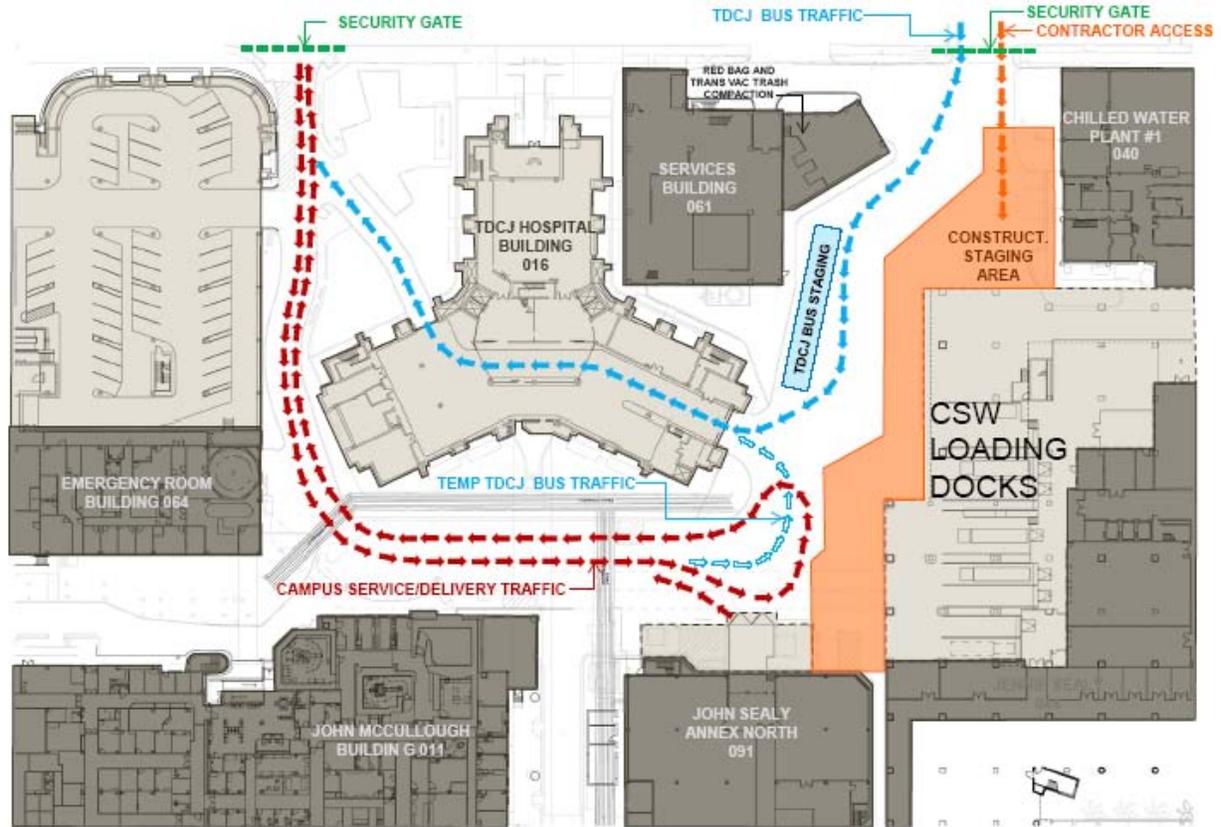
Interim Construction Service Yard Plan – Traffic Flows
